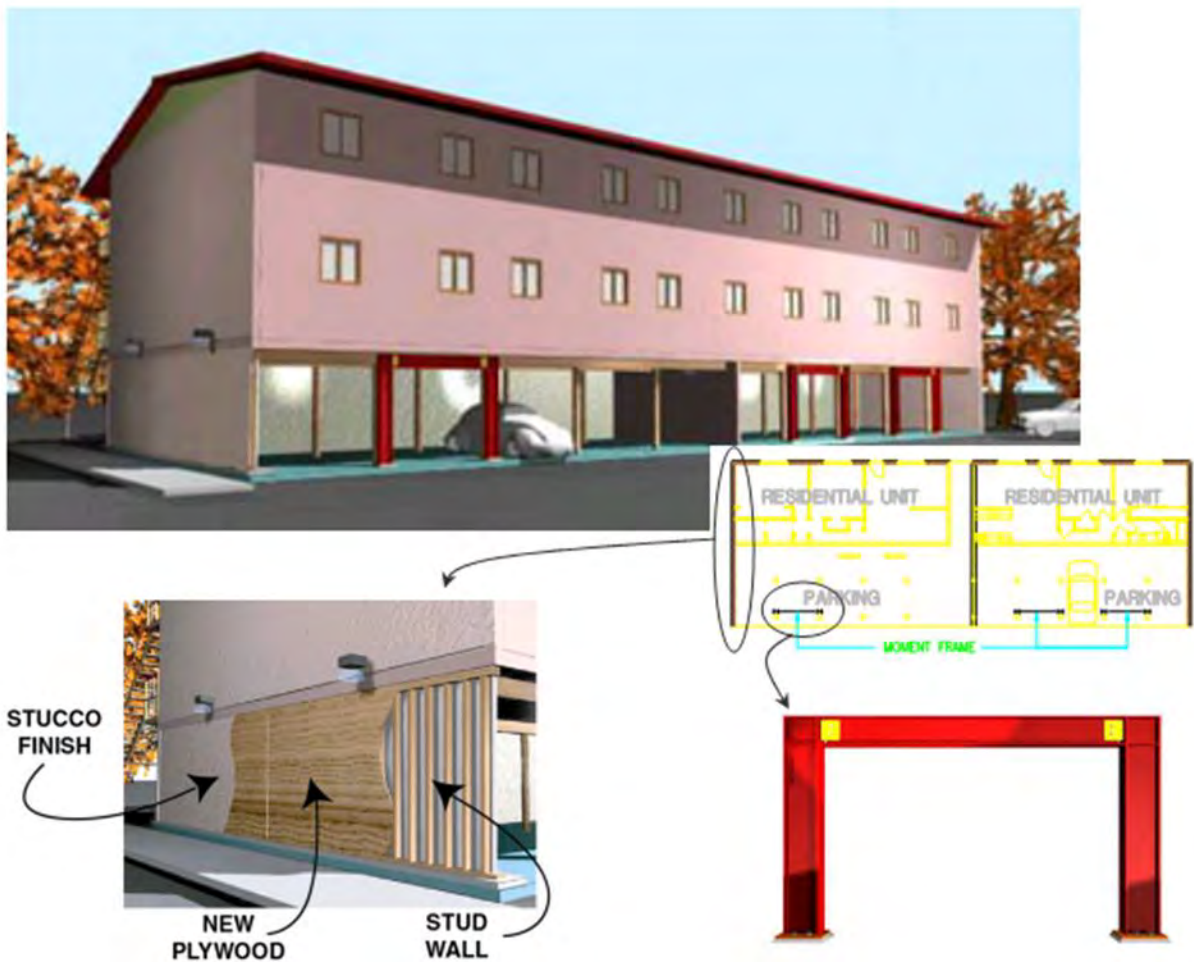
Retrofit scheme for Large Multi-family Soft-Story Wood Frame Building.
